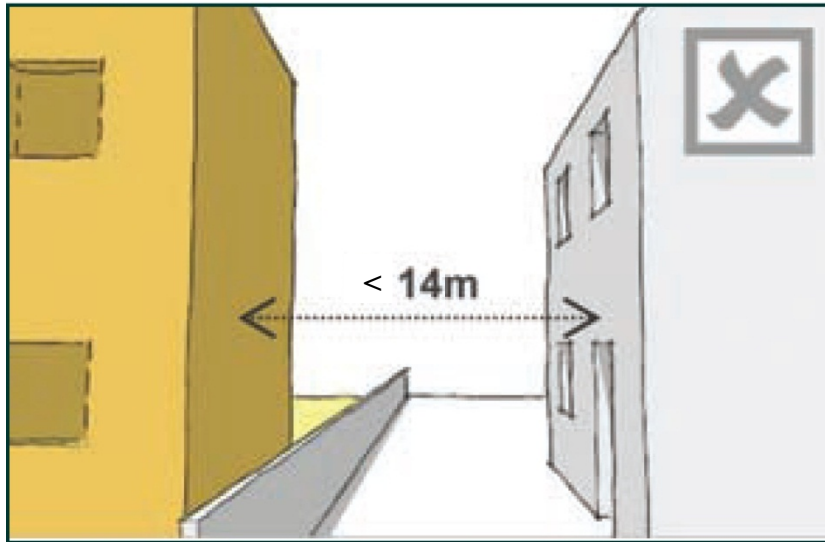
Distance of 14.00 metres between a protected window and a blank two-storey wall
